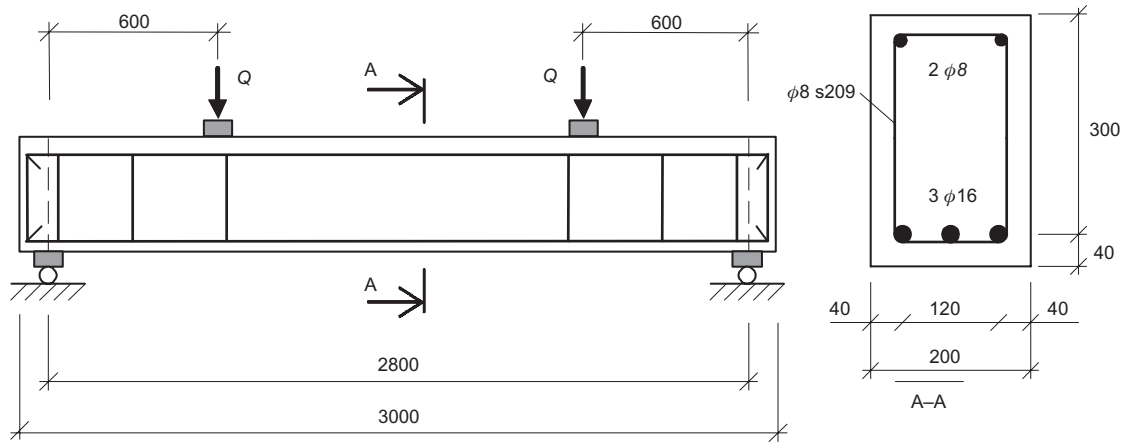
Principal testing arrangement of the four-point bending beam, NSC3
